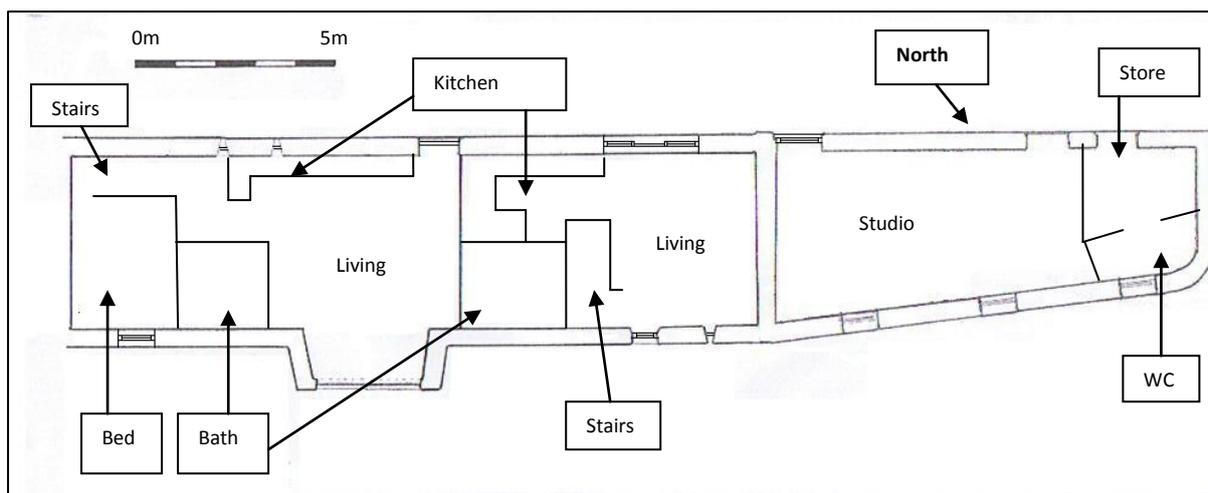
Ground plan of proposed development adjacent to Wythmoor House
